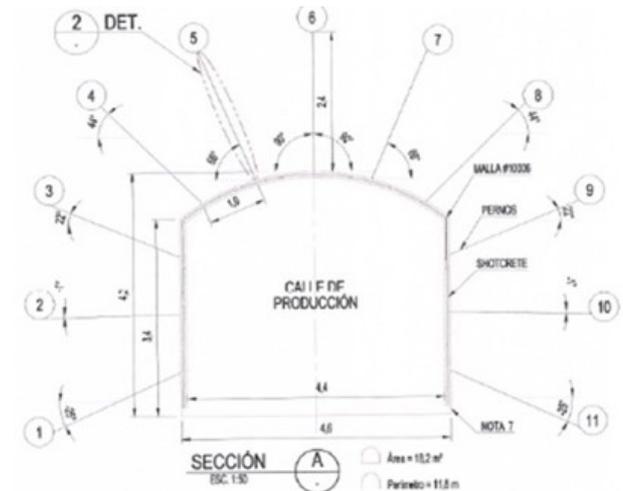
Section View Example Support Design, Macro block N1/S1, Chuquicamata Underground.
